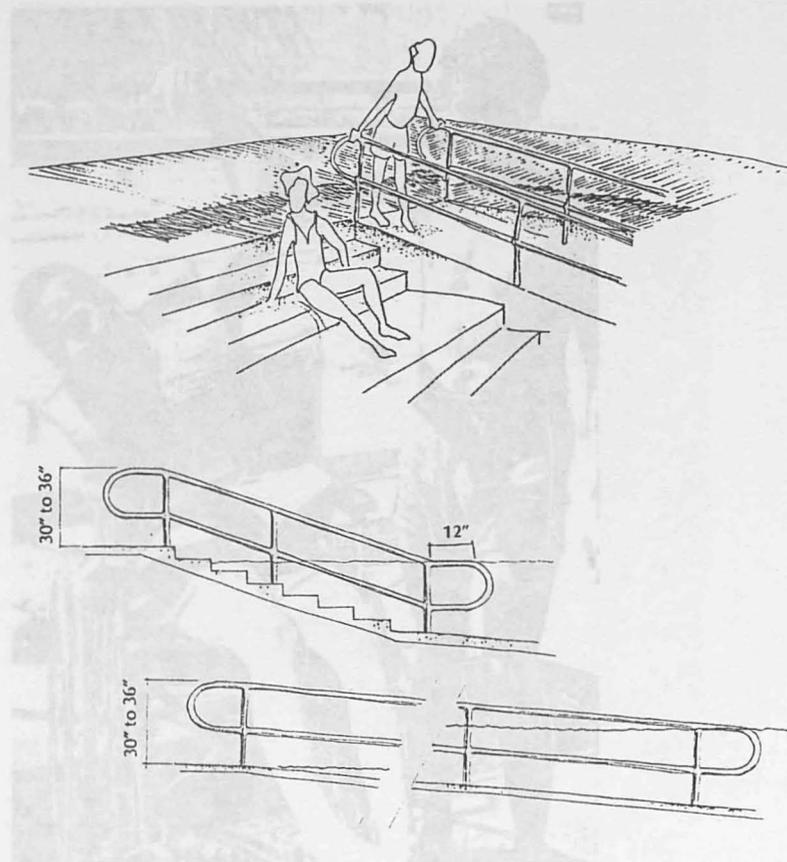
U.S. Department of the Interior, A Guide To Designing Accessible Outdoor Recreation Facilities, January 1980.
